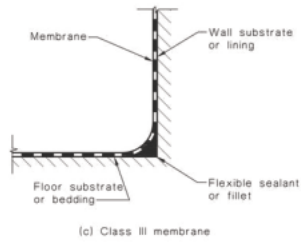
TYPICAL BOND BREAKER DETAILS
